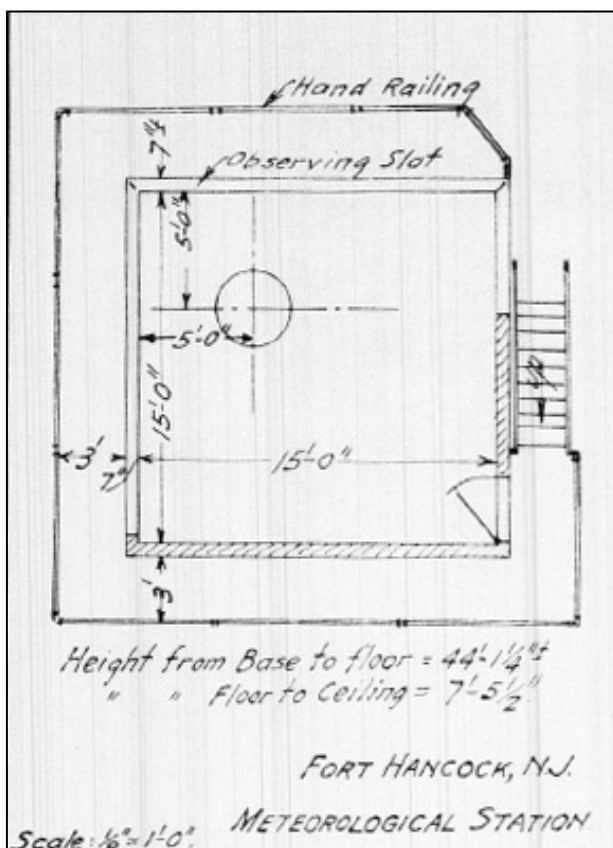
Plan of meteorological station inside west counterscarp wall of Mortar Battery, July 1, 1921.
